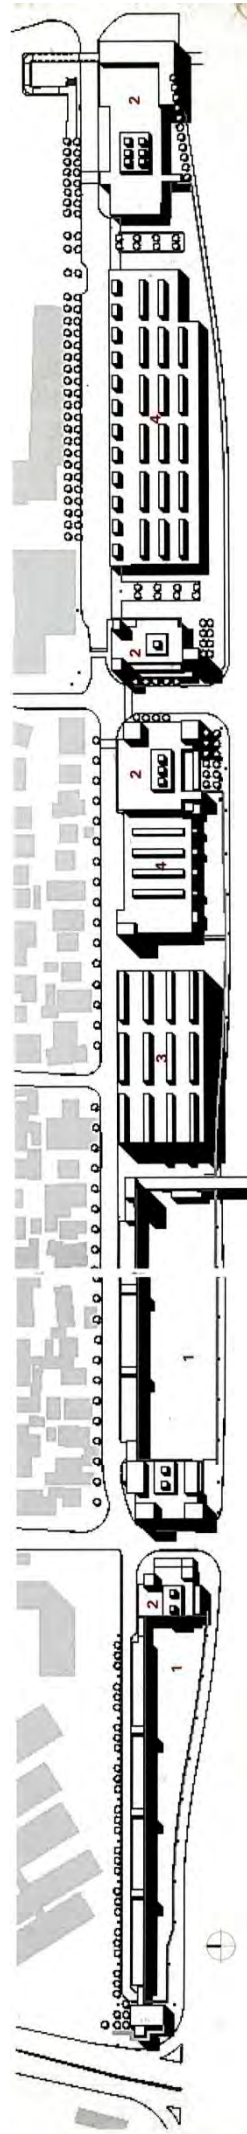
Baragwanath Transport Interchange and Traders Market- Site Plan
